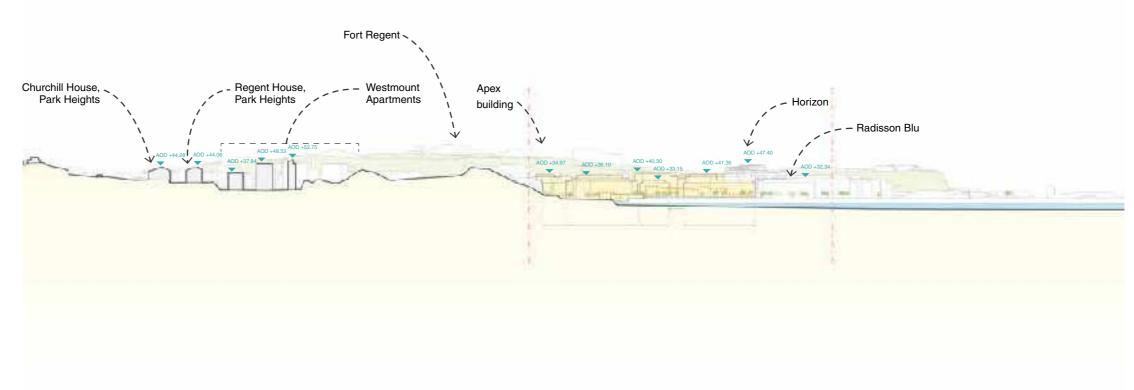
Wide section through Lower Park, West Park and Westmount Apartments
